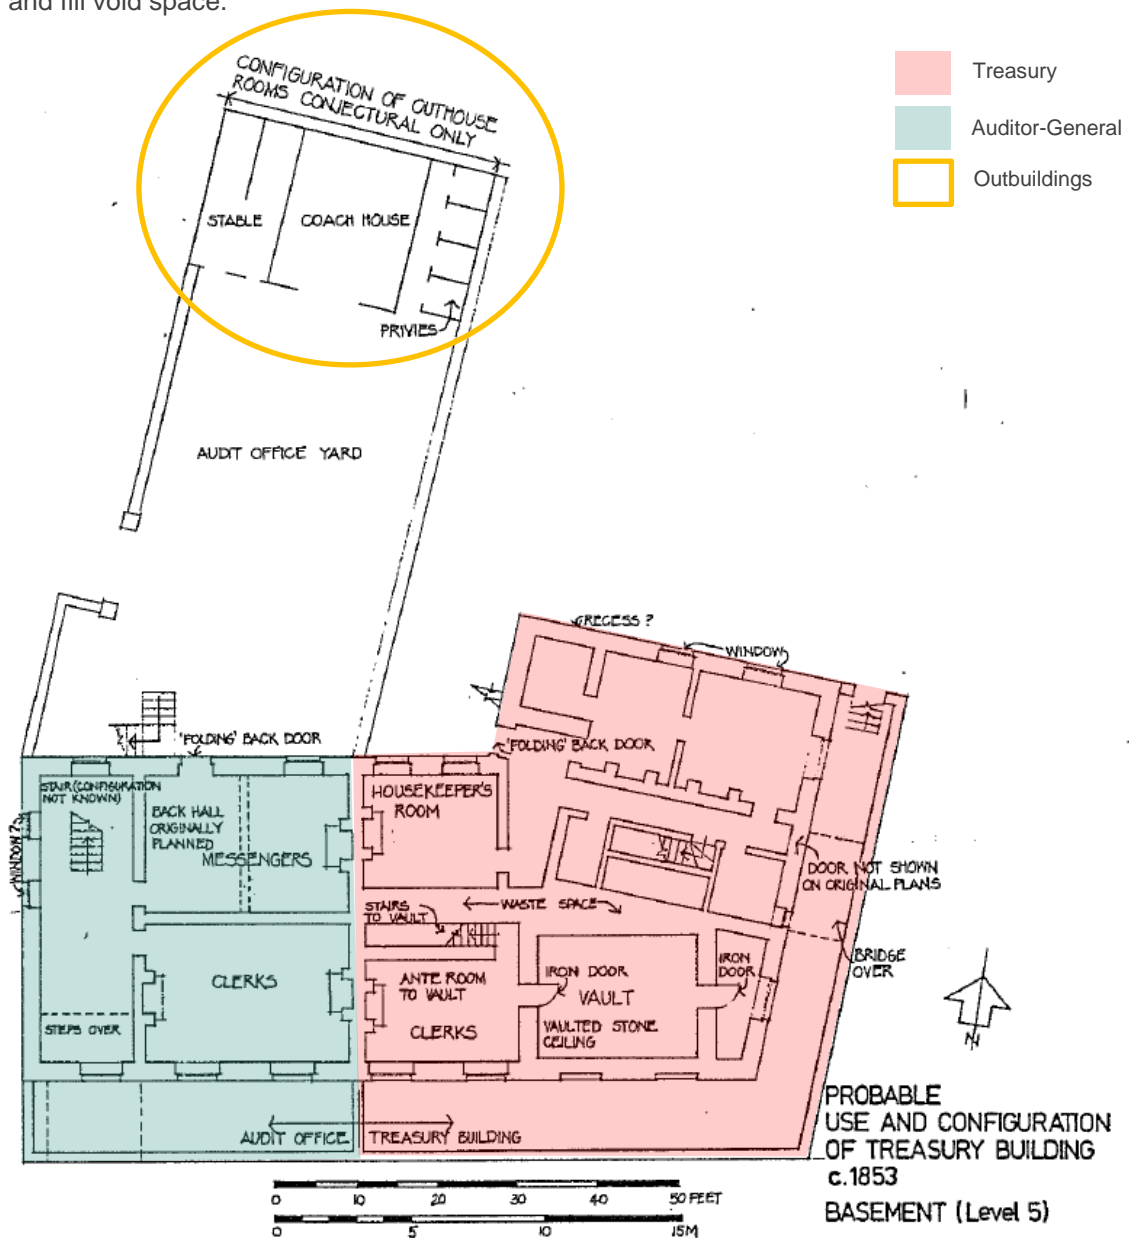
Probable use and configuration of Treasury Building c.1853 (Basement Floor)
